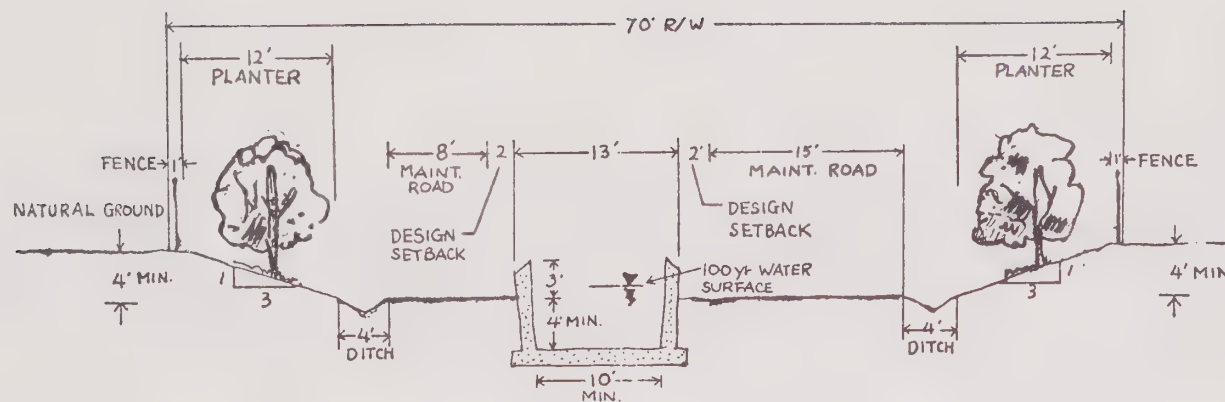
TYPICAL SECTION FOR NEAR-VERTICAL CONCRETE CHANNEL WITH DEPRESSED ROAD (Minimum 4 Ft. depressed road; minimum 2 ft. design setback; minimum total depth 8 ft.)
